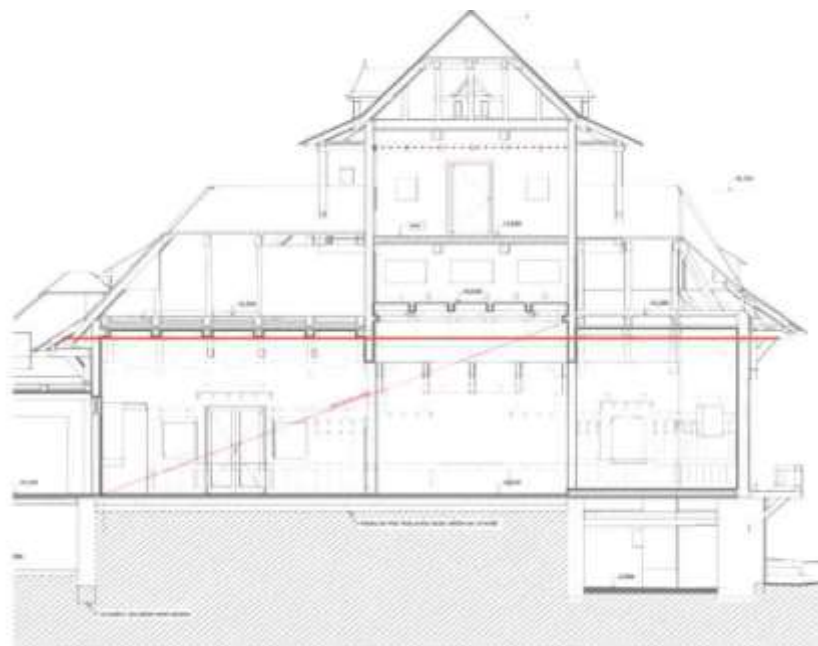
Location of fire glass (red line) as protection of coffered ceiling (Masák, 2019).
